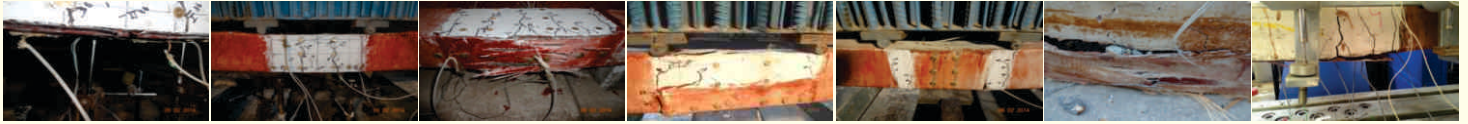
(a to c): Structural test set up and beams testing in progress
